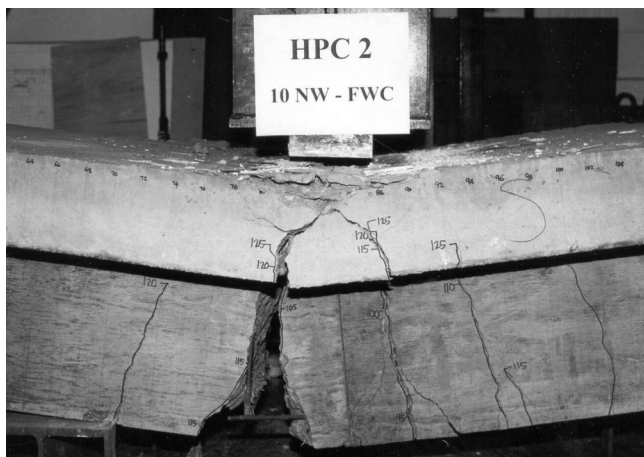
Multiple-strand development length specimen HPC-2 before failure (south face).
